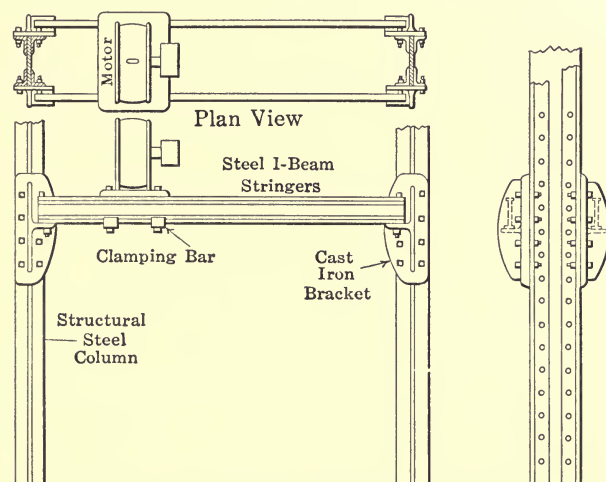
STRUCTURAL STEEL STRINGERS AND SUPPORTS.
